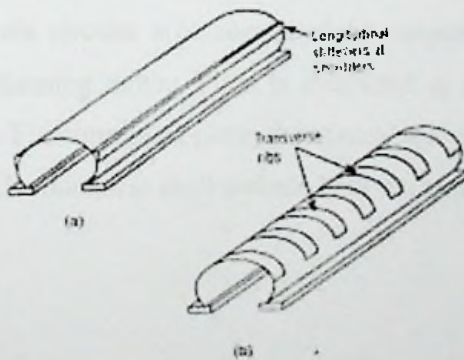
(a) Longitudinal Stiffeners (b) Transverse Stiffeners (Ref. : Design and Construction of Soil Steel Bridges, George Abdel – Sayed)
